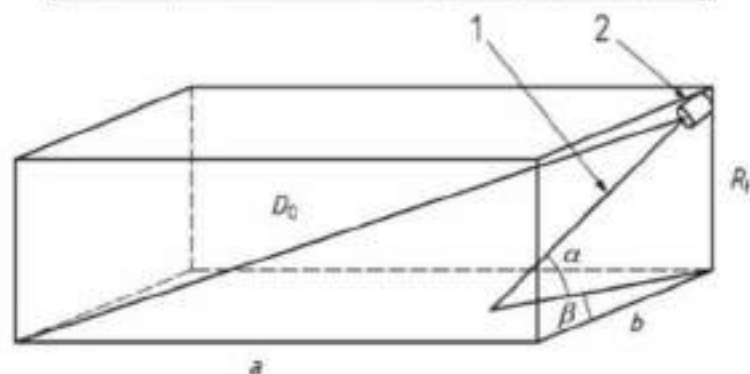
Alignment and surveillance area of flame detectors installed at room corners and on the wall
